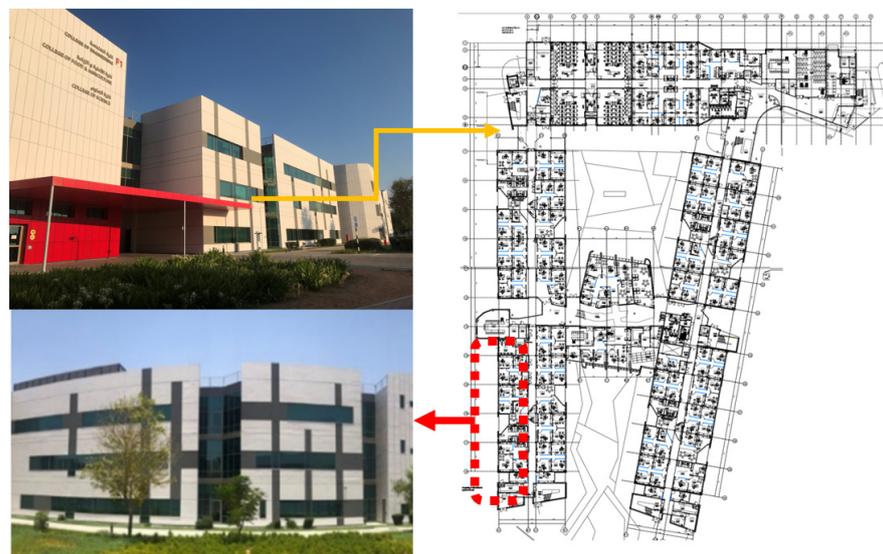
Case study building typical floor plan and exterior photos (west-facing selected block indicated in red).
